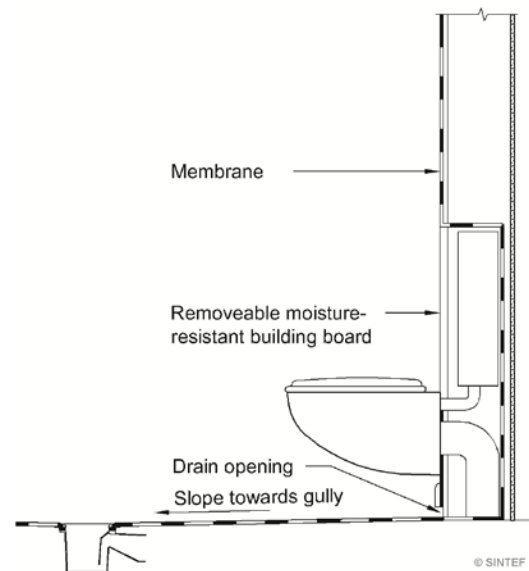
Principle sketch – Installation in wet room (Source: SINTEF Building and Infrastructure)
